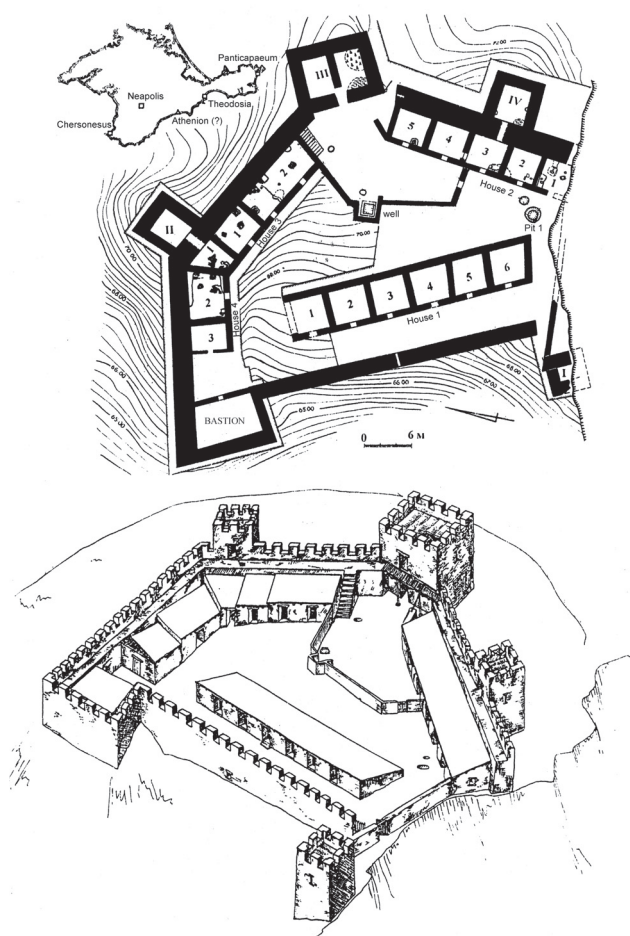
Layout and reconstruction plan of the Kutlak fortress.
